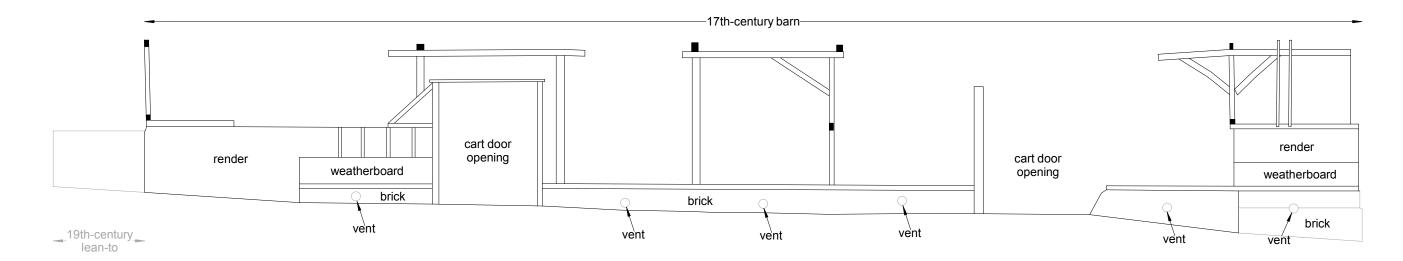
West elevation of structure 4 (17th-century aisled barn), with alterations shown grey.
